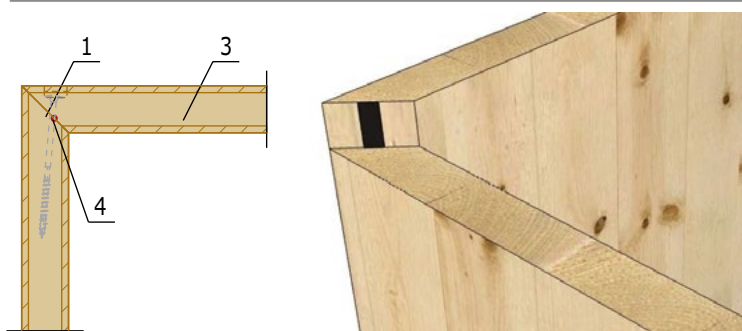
DETAIL OF CORNER JUNCTION 124, 84 – JOINT WITH OVERLAP
